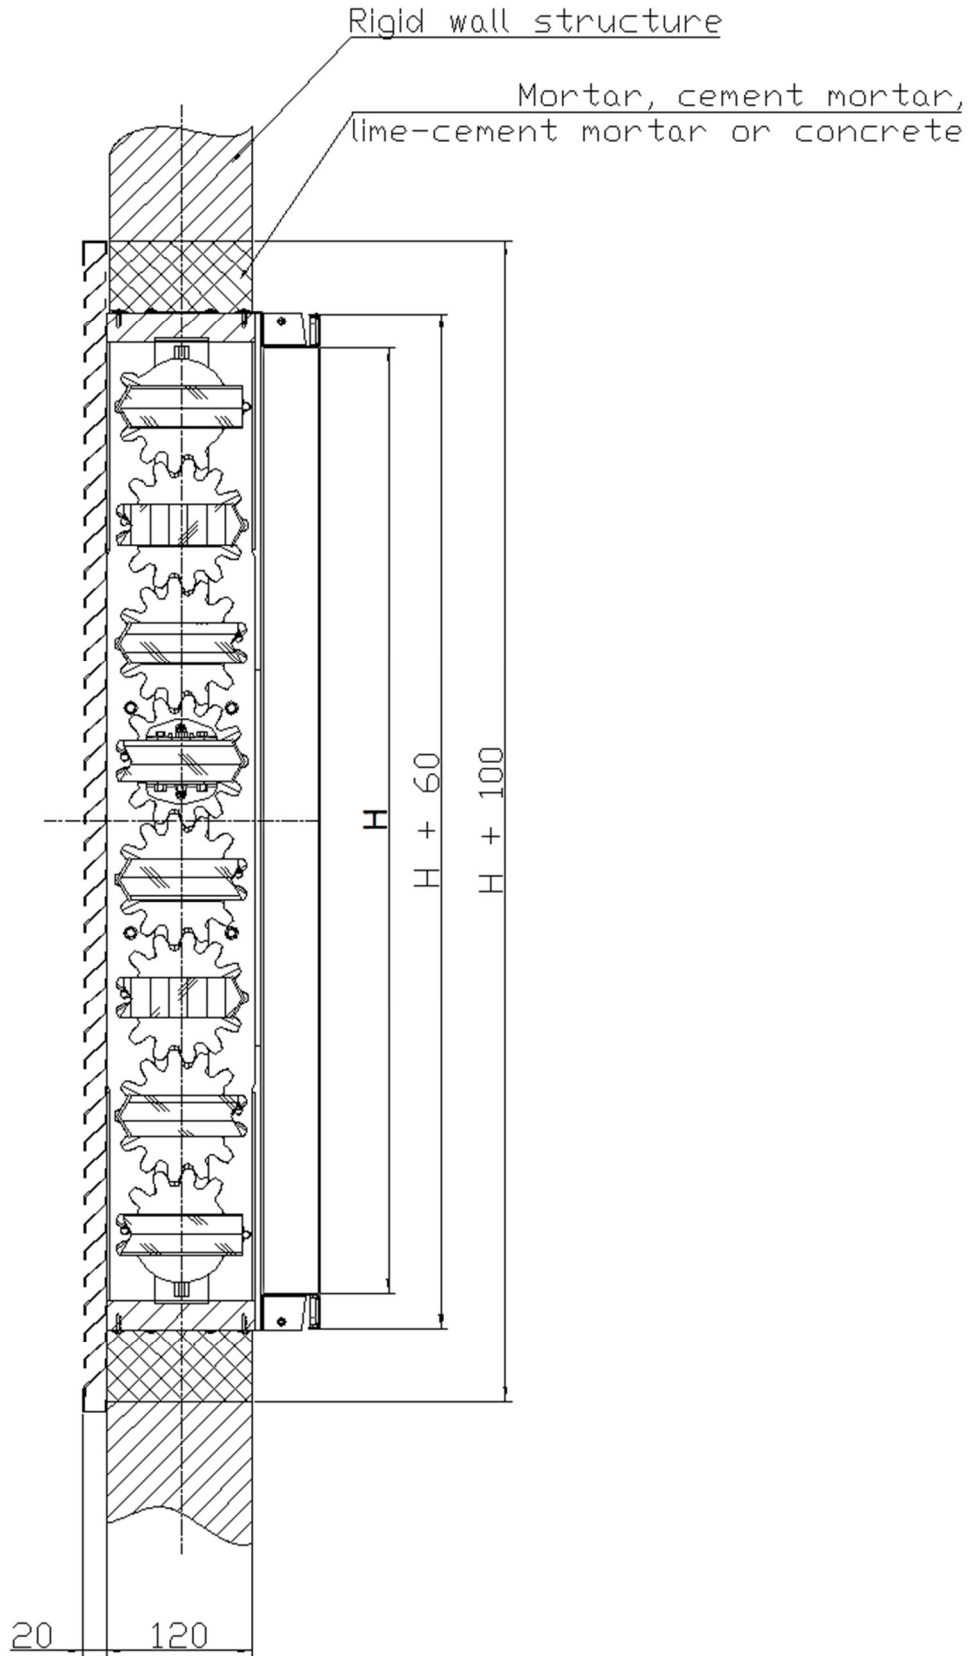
Installing method of WKP-P fire dampers in rigid wall
